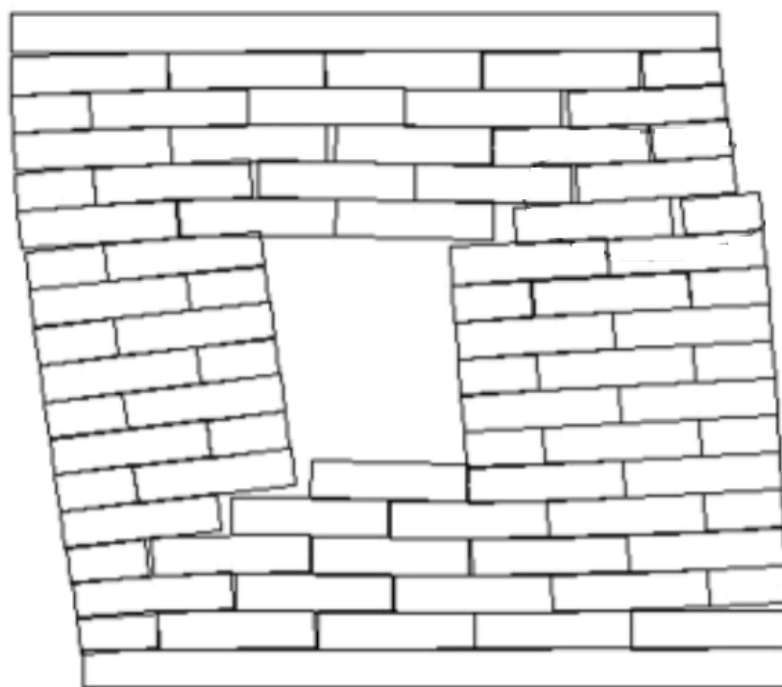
Masonry Cracking under Discrete Modelling approach [90]
